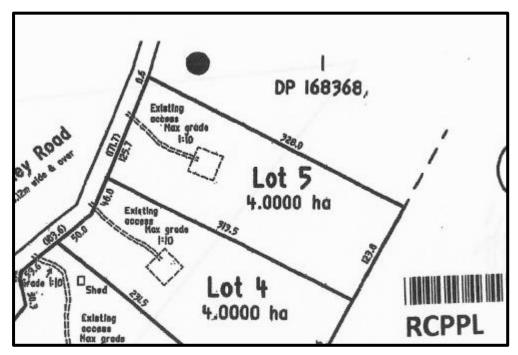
Approved Plan showing current approved 'Building Development zones'.
